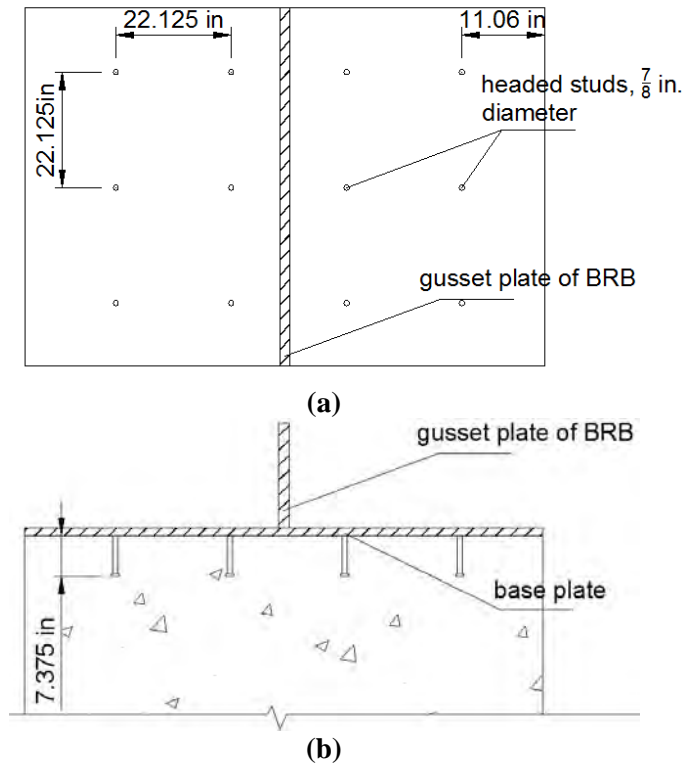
(a) Top view of BRB gusset plate connected with foundation (b) Side view
